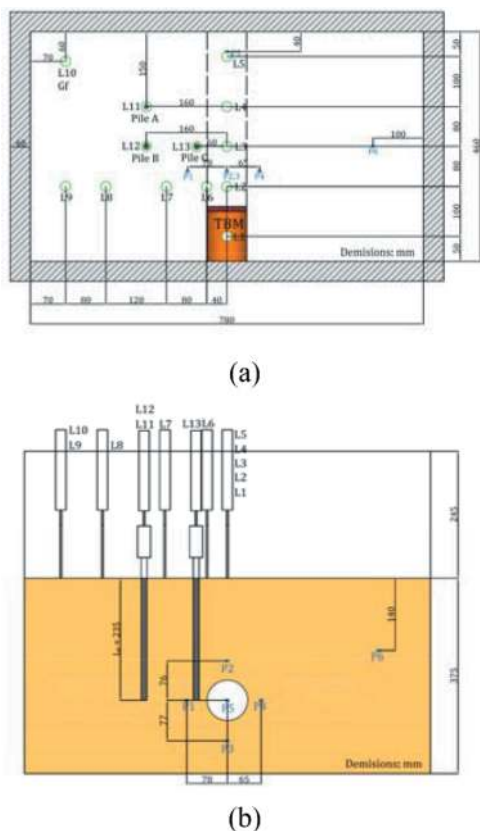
Layout performed in this centrifuge test: (a) plan view; (b) section view.
